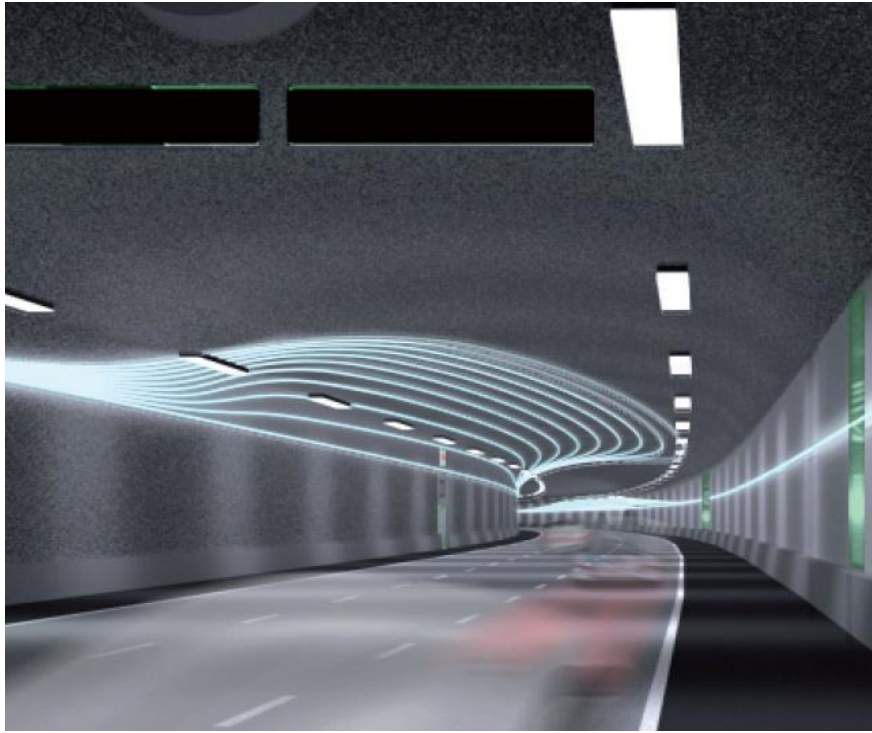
Concept design from the Stockholm bypass project (a new 21kilometres motorway with 18 kilometres of tunnels), Stockholm, Sweden^{xvi}
